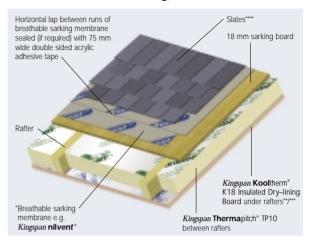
Fully Filled Insulation Between Rafters – 18 mm Sarking
